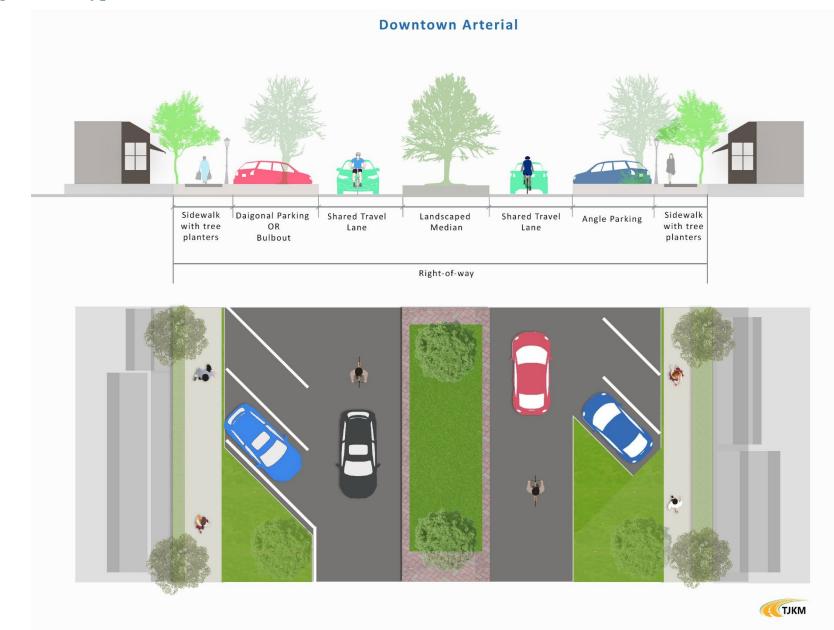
Typical Road Plan – Downtown Arterial Street
